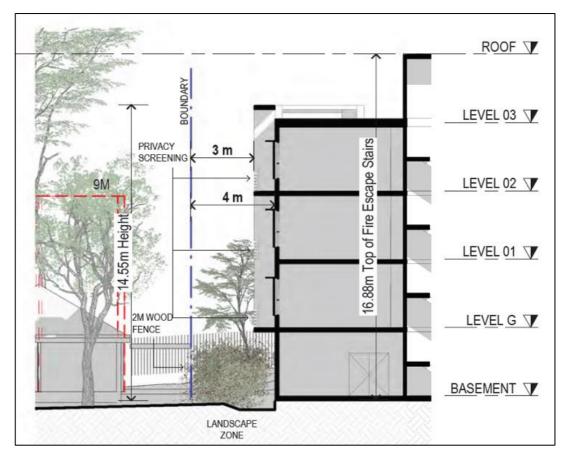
Western Boundary Section Plan Source: O'Neill Architecture
